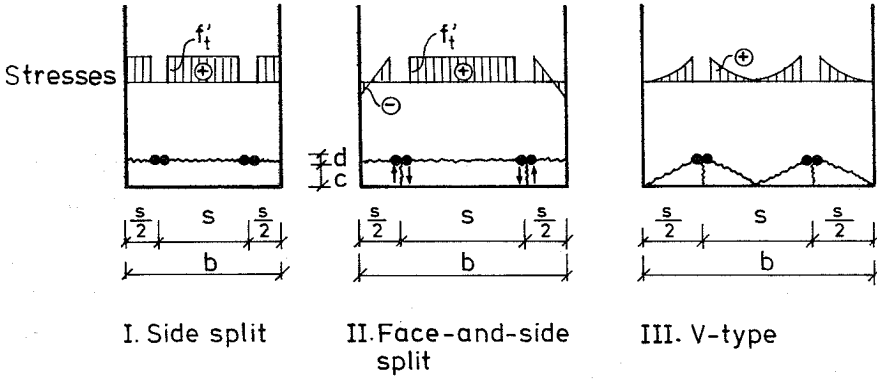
Failure patterns used by Ferguson & Briceno [69.1]. The stresses in the concrete in a horizontal section through the bars at failure are indicated.
